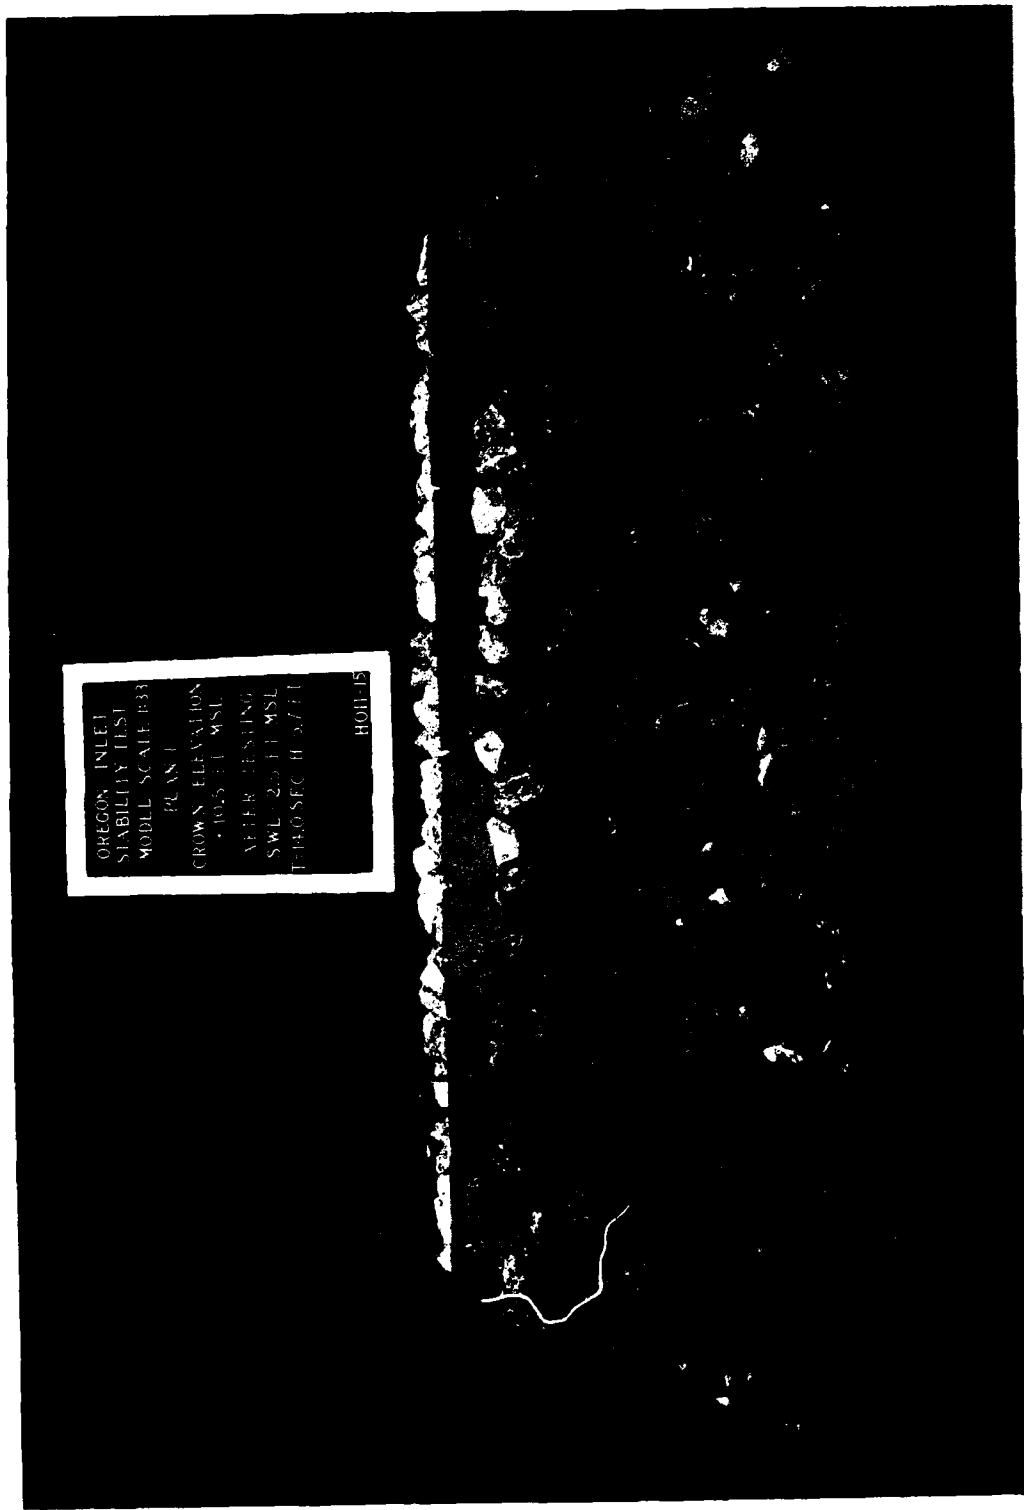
Sea-side view of Plan 1 after attack of 14-sec, 5.7-ft waves at an swl of -2.5 ft NGVD
